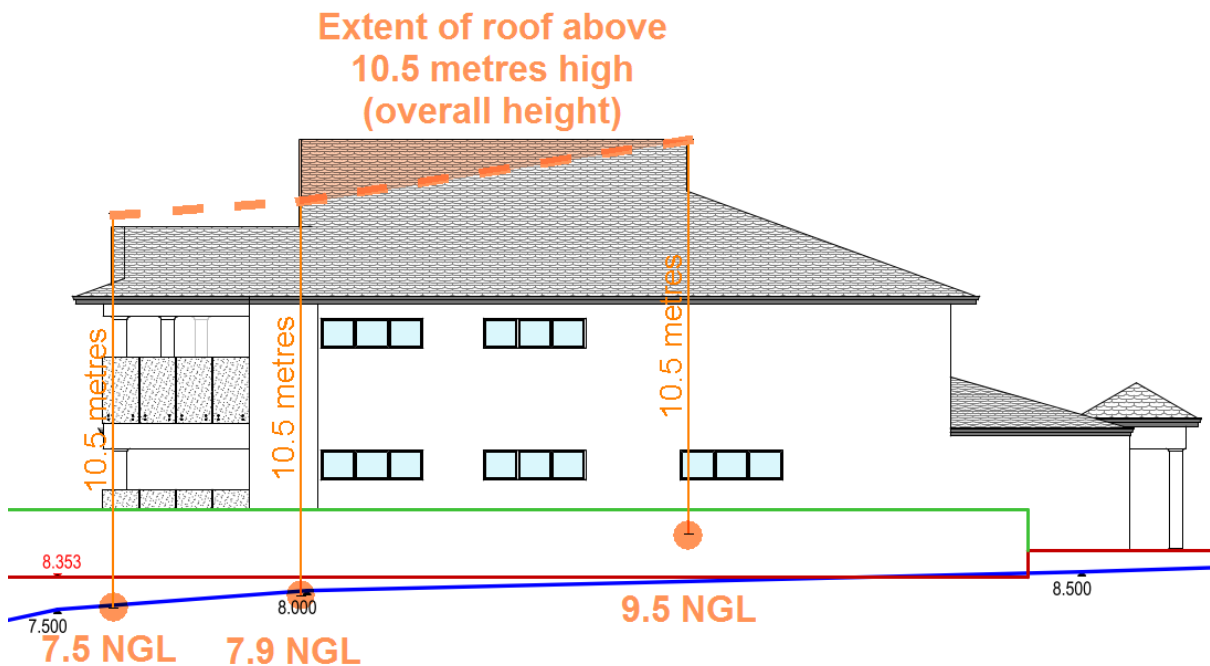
Elevation plan of the subject dwelling identifying the portion of dwelling exceeding the overall 10.5 metre building height.
